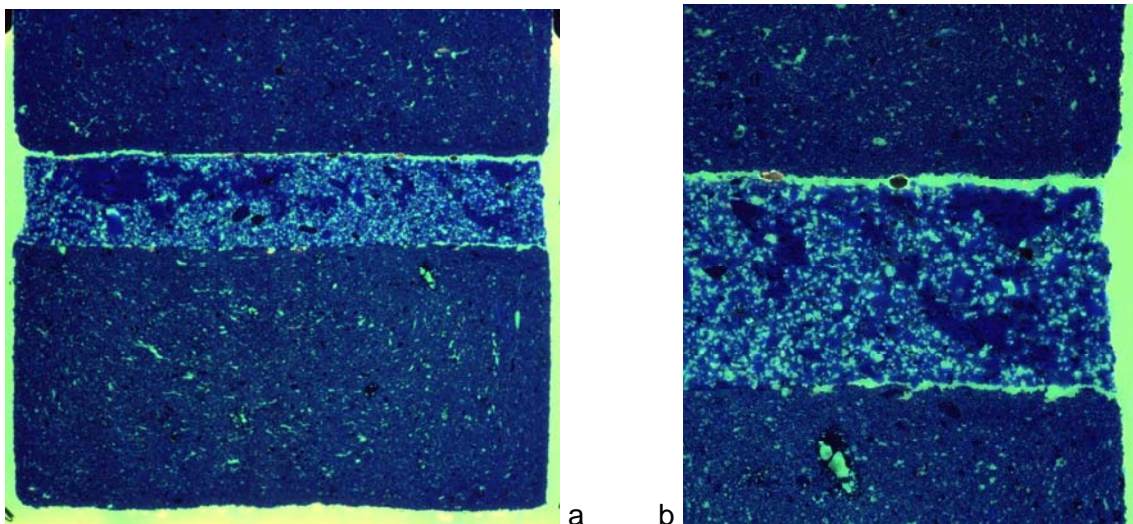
a) Vertical section over a full general purpose mortar bed-joint. b) Detail showing the edge of the mortar bed. Fissures from the outside run into the masonry. Photographs taken after impregnation [VMF 98].
